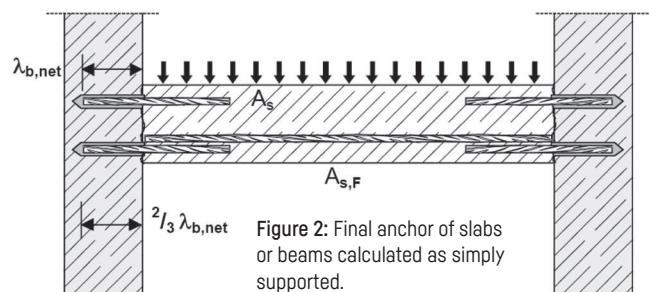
Final anchor of slabs or beams calculated as simply supported.
